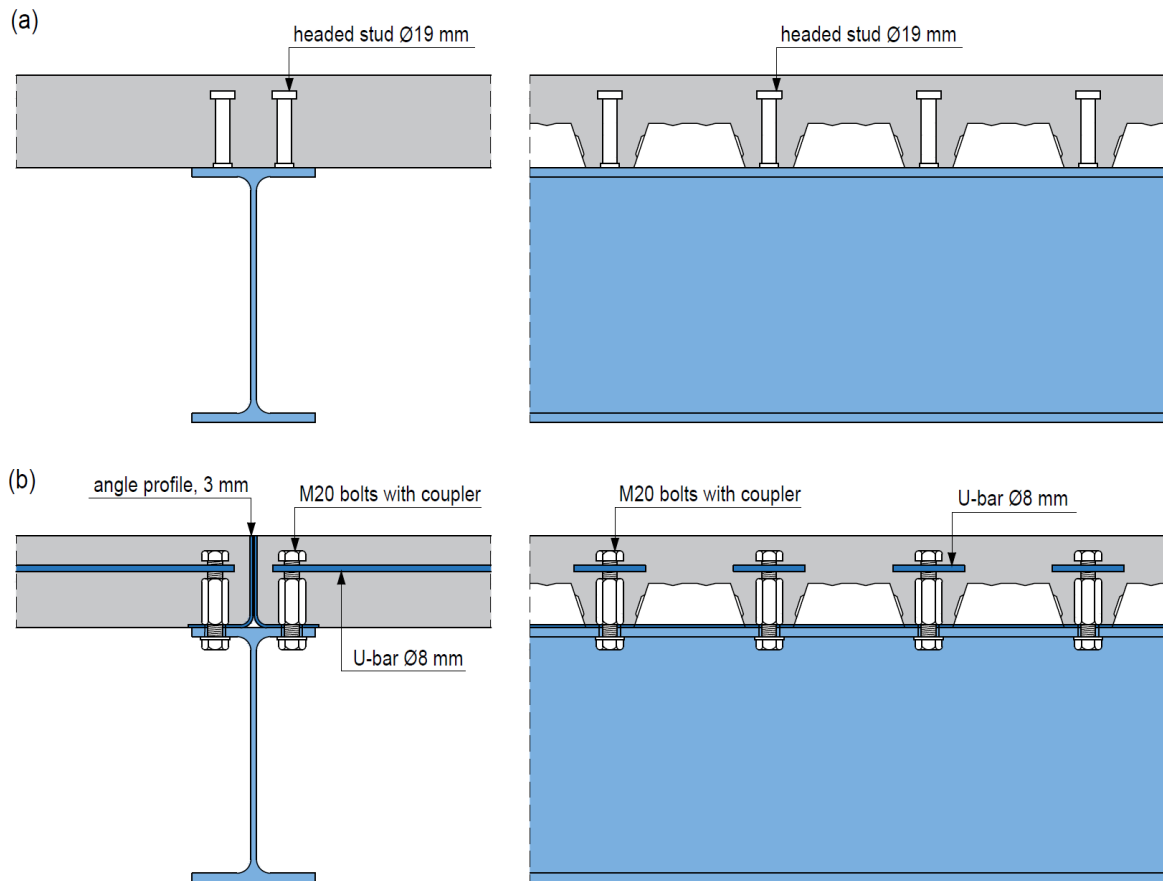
Shear connection: (a) non-demountable, (b) demountable
